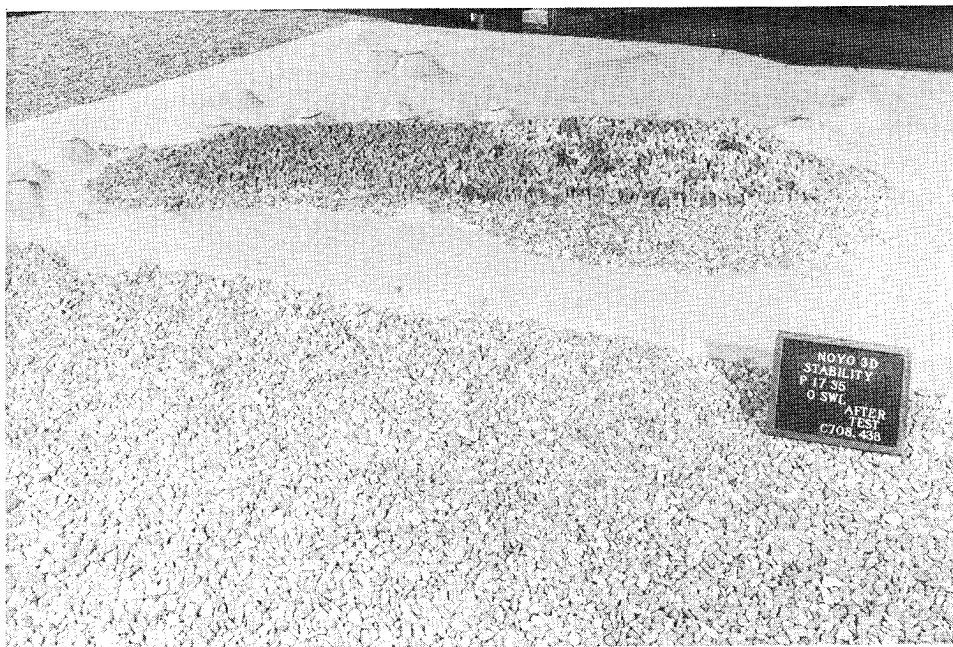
Leeward side view of Plan 17 after five series of modified Storm IB waves at +0 m mllw
